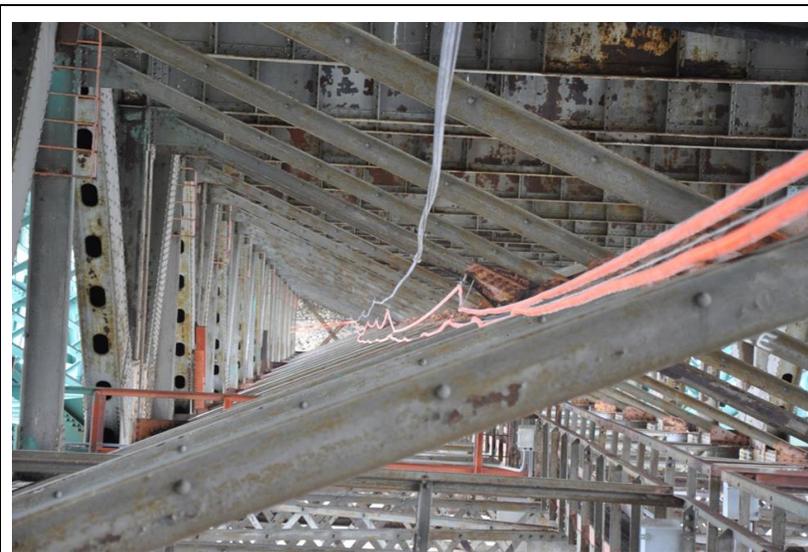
Bridge No. 00571A, Navigation Lights.
